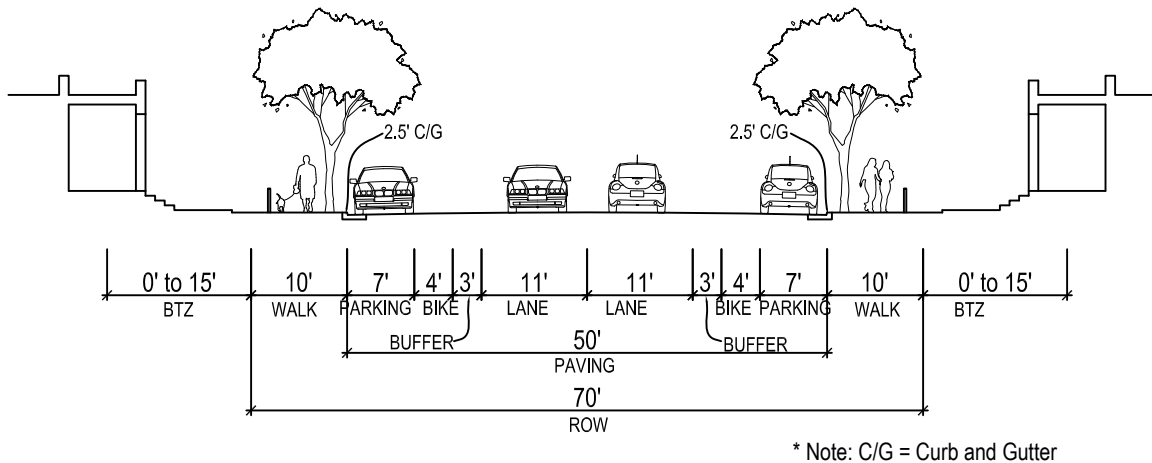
Street Type 4.2: Park Edge Double-Loaded Cross Section
